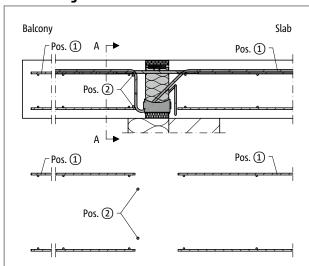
Schöck Isokorb® T type K-E, K-T: On site reinforcement; inner slab edge with wall support
